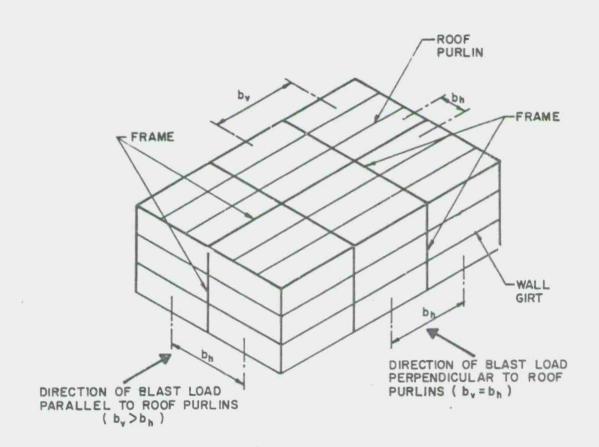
Orientation of roof purlins with respect to blast load direction for frame blast loading
